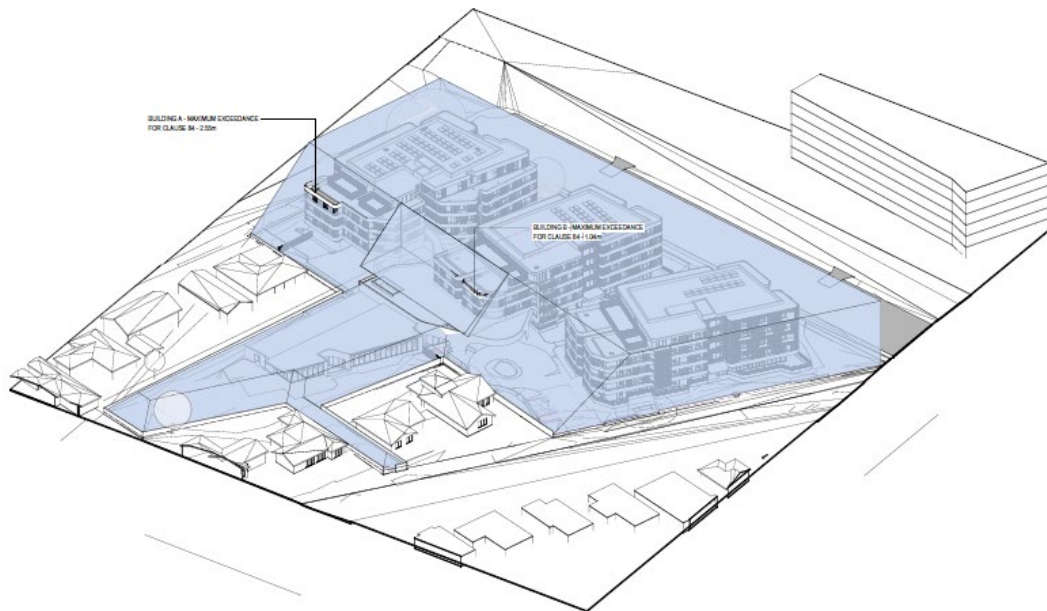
Proposed Building B Section 84 Building Envelope Compliance (Jackson Teece)
